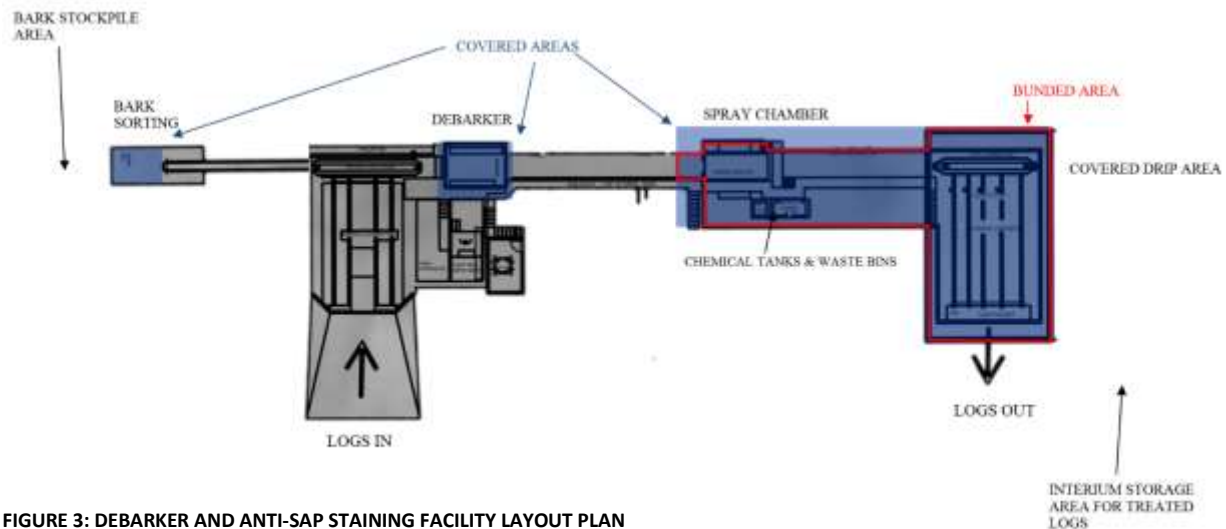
DEBARKER AND ANTI-SAP STAINING FACILITY LAYOUT PLAN
